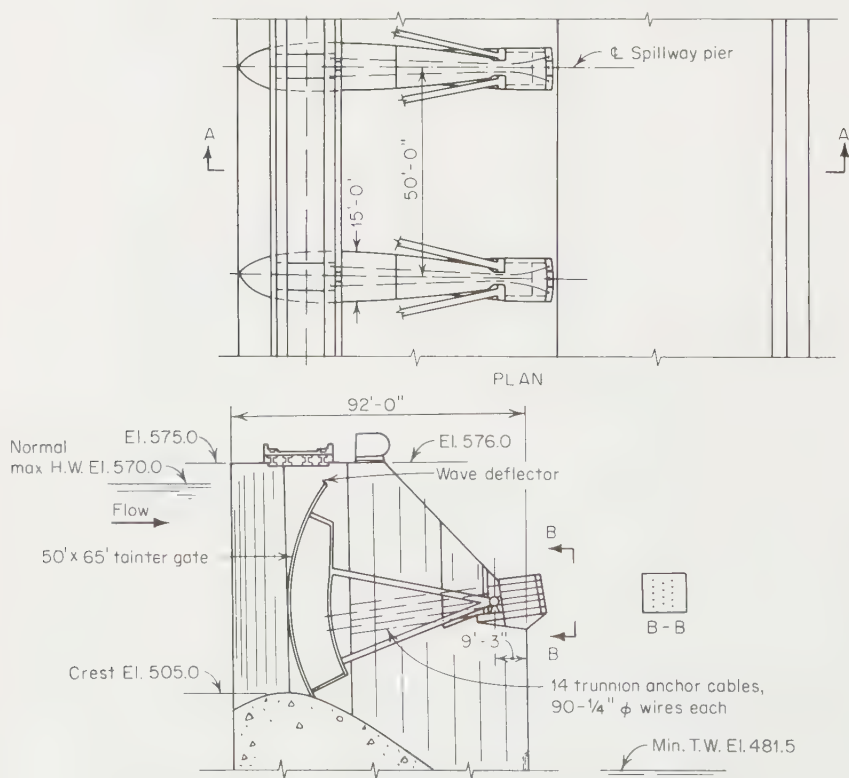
Piers at the Wanapum Dam (Columbia River, 1960).
